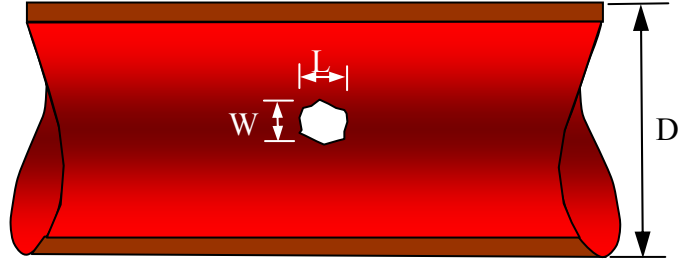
Schematic Drawing of Local Loss of Pipe Wall
